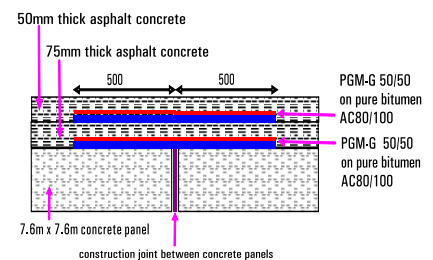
Typical cross section of concrete pavement with Polyfelt PGM-G 50/50 paving fabric.
